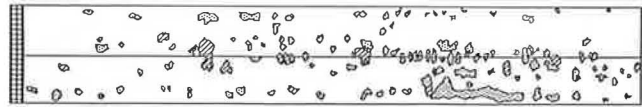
Spalling pattern on Blue Rapids bridge deck in Kansas (21).
